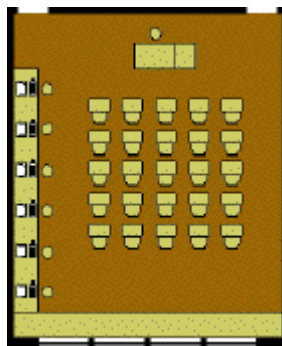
Floor plan of the Math classroom (ref: Lab Plan)
